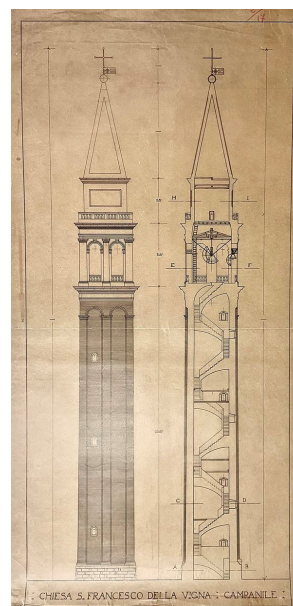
Belltower elevation and section, from Venice Superintendency Drawings Archive
